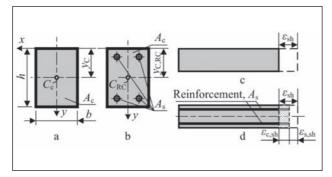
Deformations of concrete and RC member due to shrinkage: a) plain concrete member; b) symmetrically reinforced section; c) free shrinkage deformation; d) deformations in a symmetrically reinforced element due to restrained shrinkage
